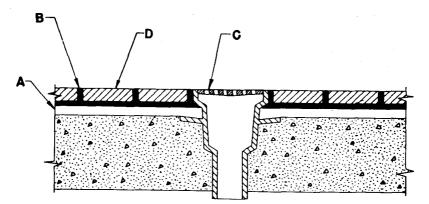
Typical floor drain construction: (A) ¹/4-in. asphalt interliner with glass cloth reinforcing and concrete primed with asphalt primer; (B) chemically resistant mortar joints; (C) "Josam" or similar type of floor drain; (D) acid-proof brick, top surface of drain and cover should not be less than ¹/₁₆ in below the surface of surrounding floor.
